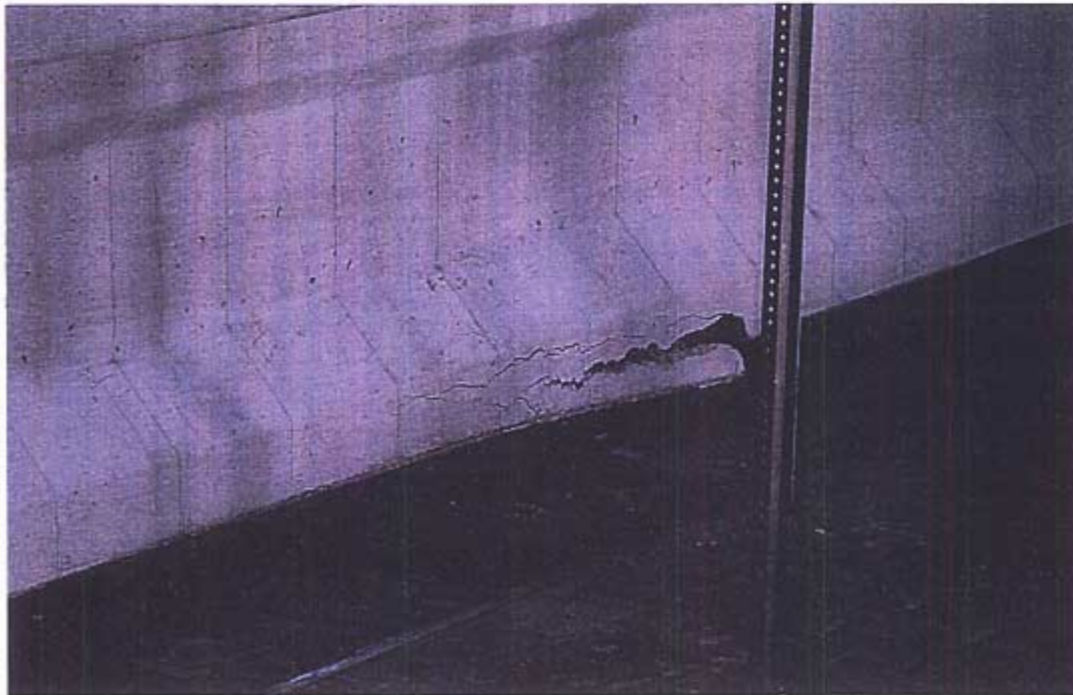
Test Specimen 3 During Loading Showing Crack Propagation on South End of Girder at the Bottom Layer of Prestressing
